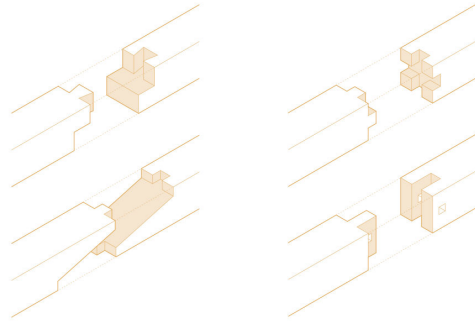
Traditional Japanese Joints: (top to bottom) Dovetail lap joint, scarf with stub tenon joint, stub tenon with pin joint, cross stub tenon joint.
